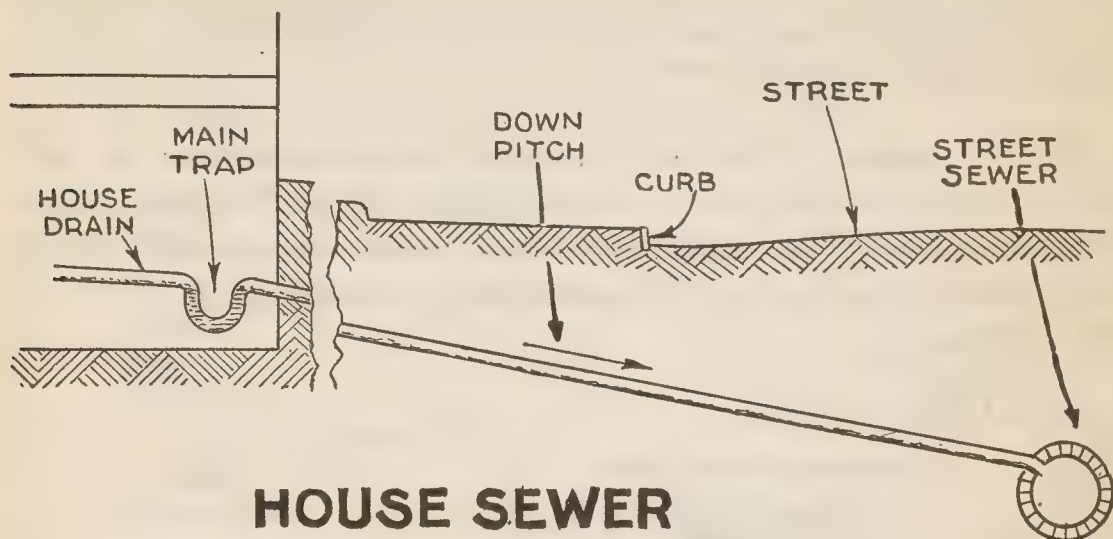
,649.—House sewer or connecting house drain at main trap end with the street sewer and showing its downward pitch to secure proper flow of the sewage into the street sewer.
